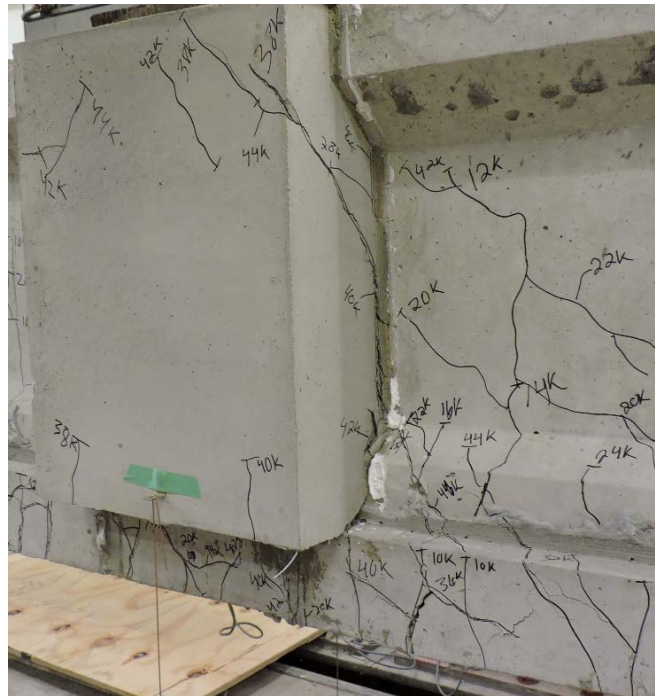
R2-FRSCC Joint Cracking, Longitudinal & Transverse Faces (Front Left)
